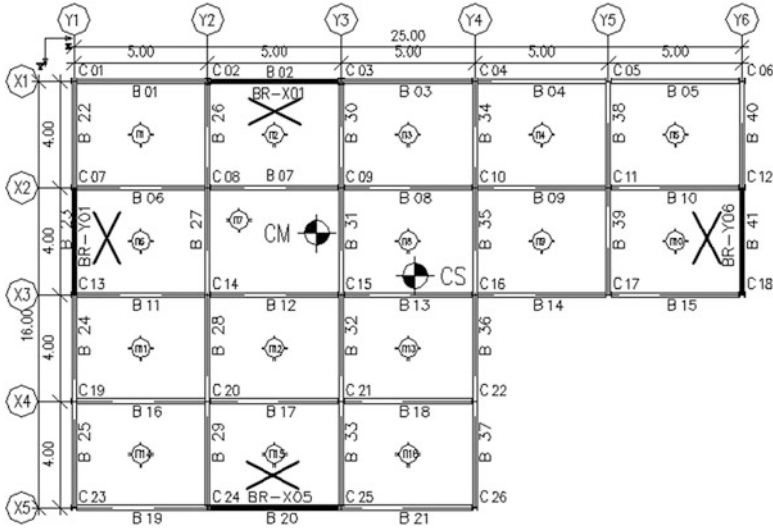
Layout of the three-story torsionally stiff steel building
